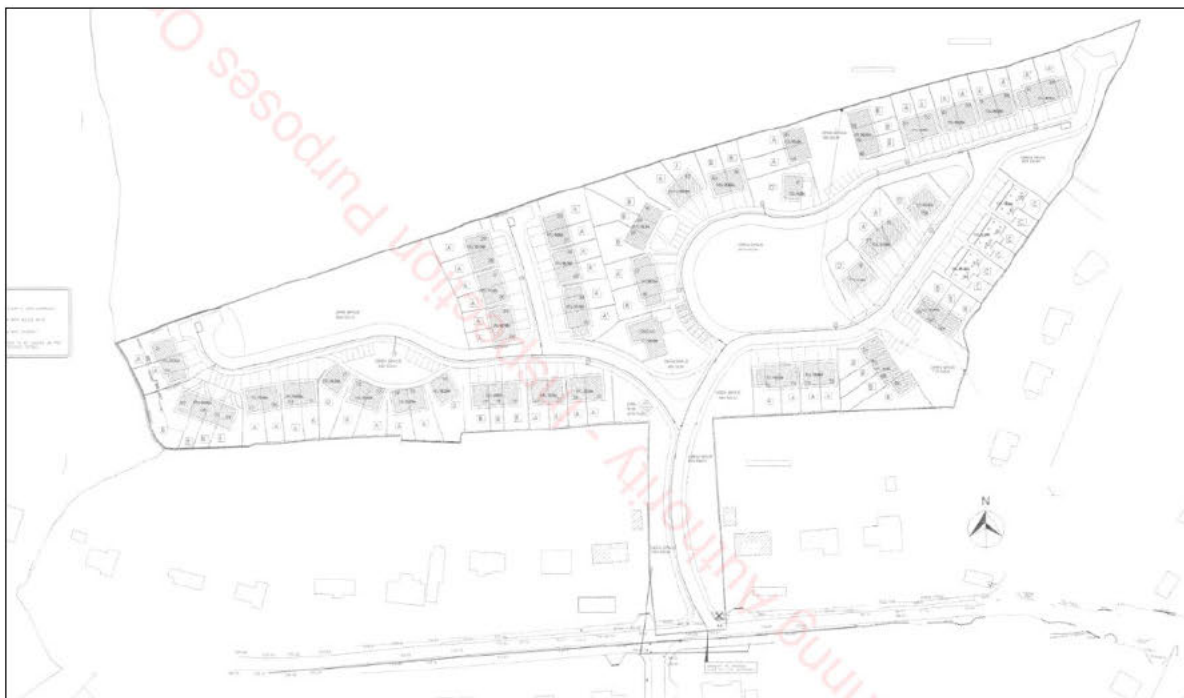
Approved Site Layout Plan under Reg. Ref. 071779
